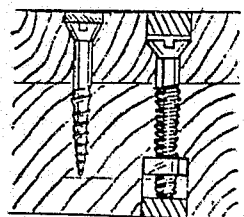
Cross section of recessed and plugged fasteners. On the left is a flat-head screw; on the right is a flat-head stove bolt which has plugs over both ends.
